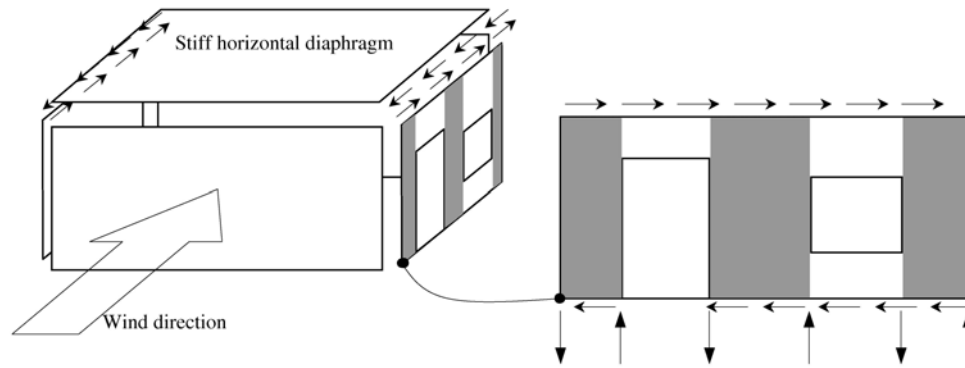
A traditional stabilizing approach used for timber-frame structures. Only the vertical, continuous (grey) strips are accounted for in the analysis.
